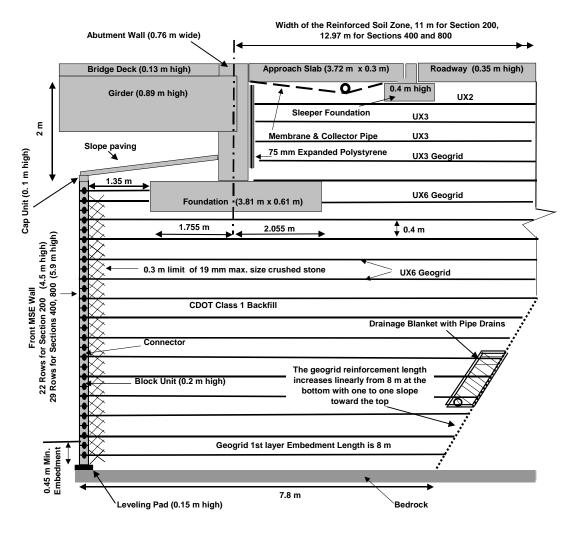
Typical monitored cross-section (sections 200, 400, and 800 in Figure 2) through the front and abutment MSE walls.
